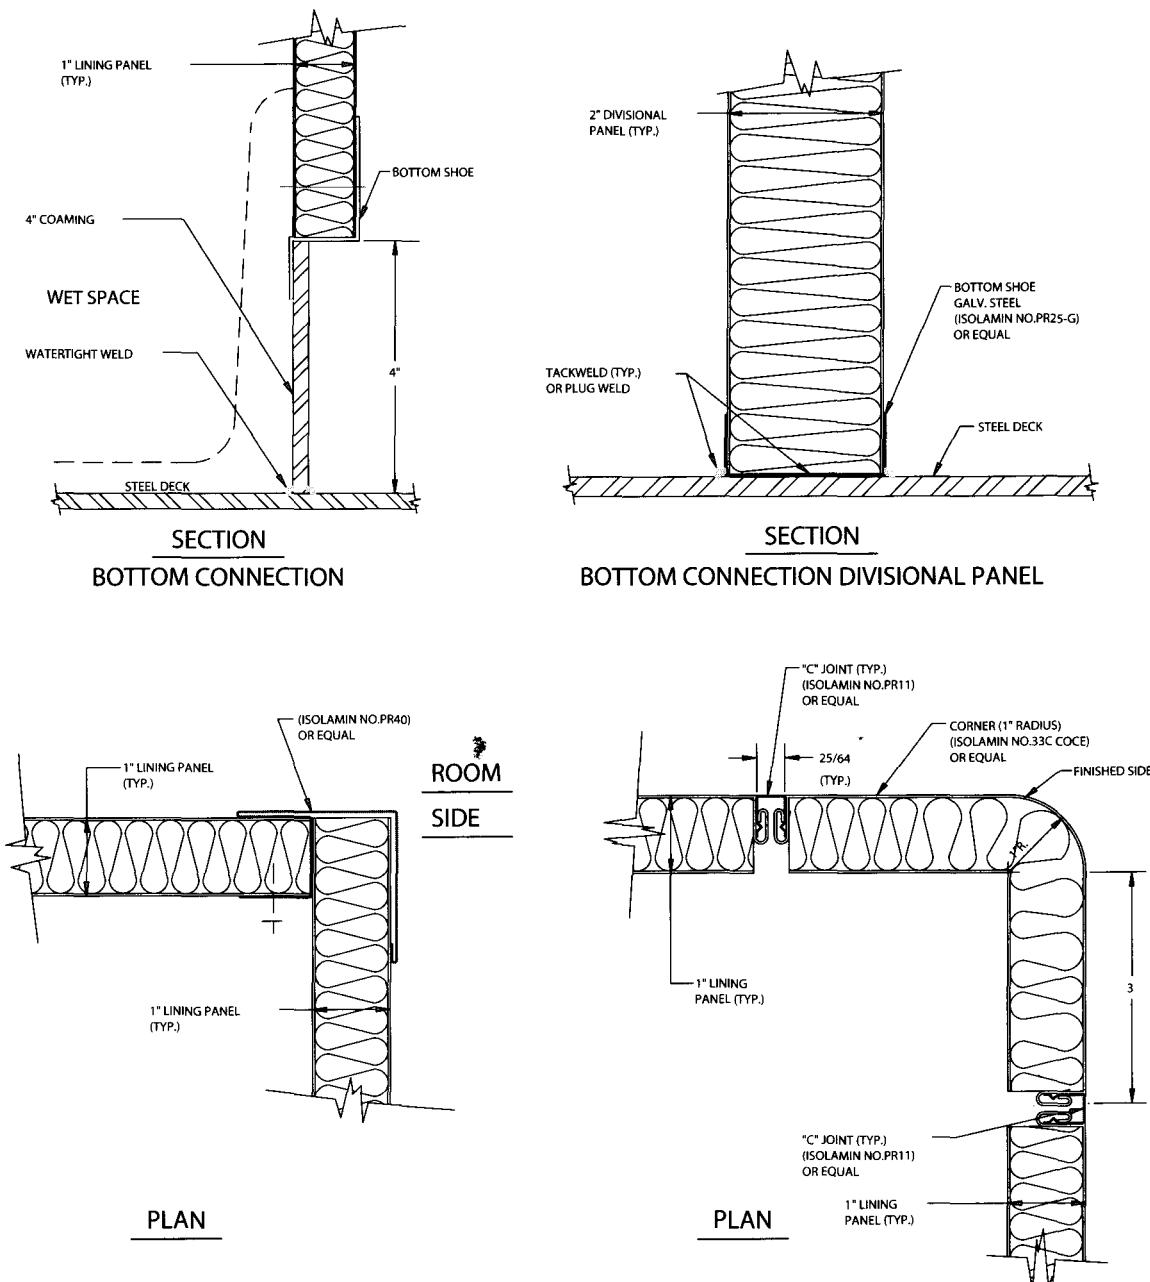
(b) Typical Joiner Linings and Ceiling Details—Joiner Bulkhead and Lining Details
